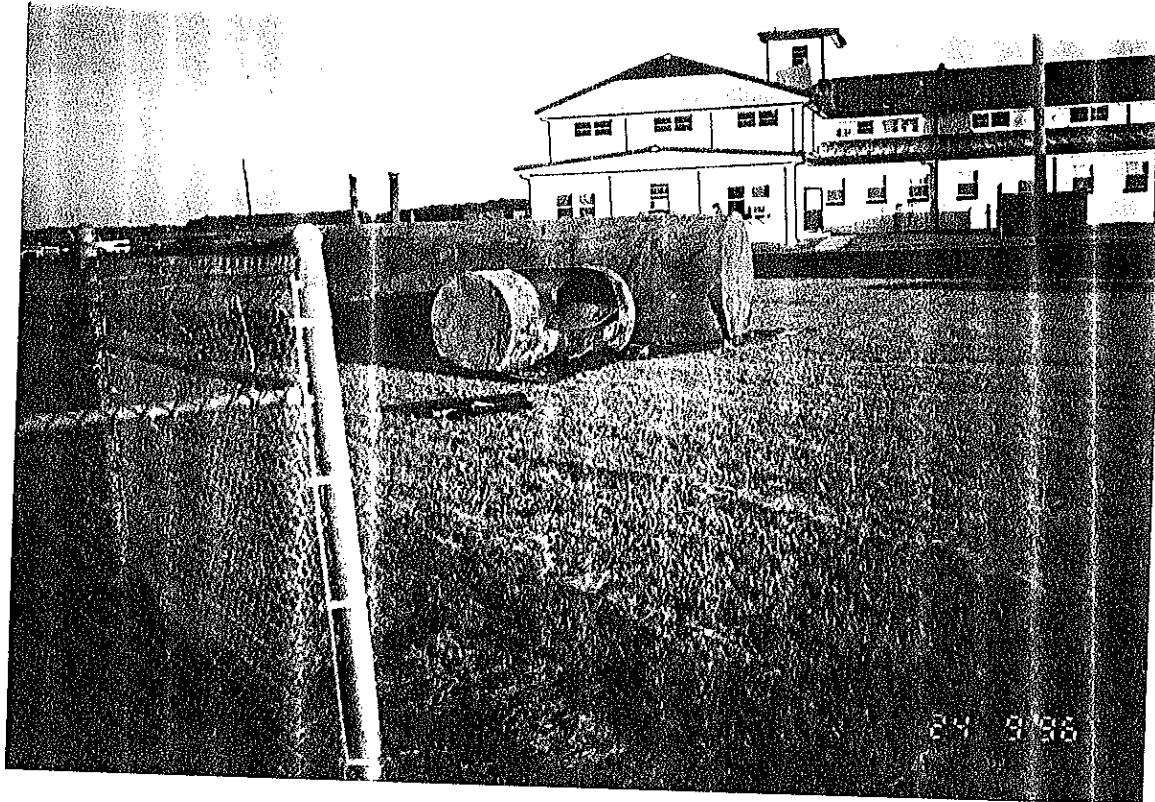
Tanks 27 & 28 after removal, cutting and cleaning.
